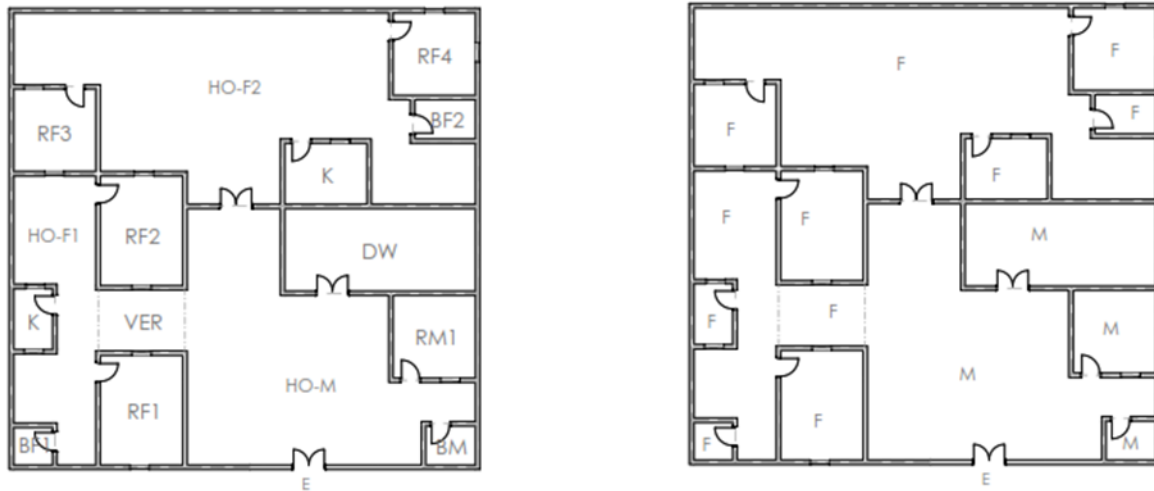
Case 15 - Layout Plan and the Male & Female Domains Layout
